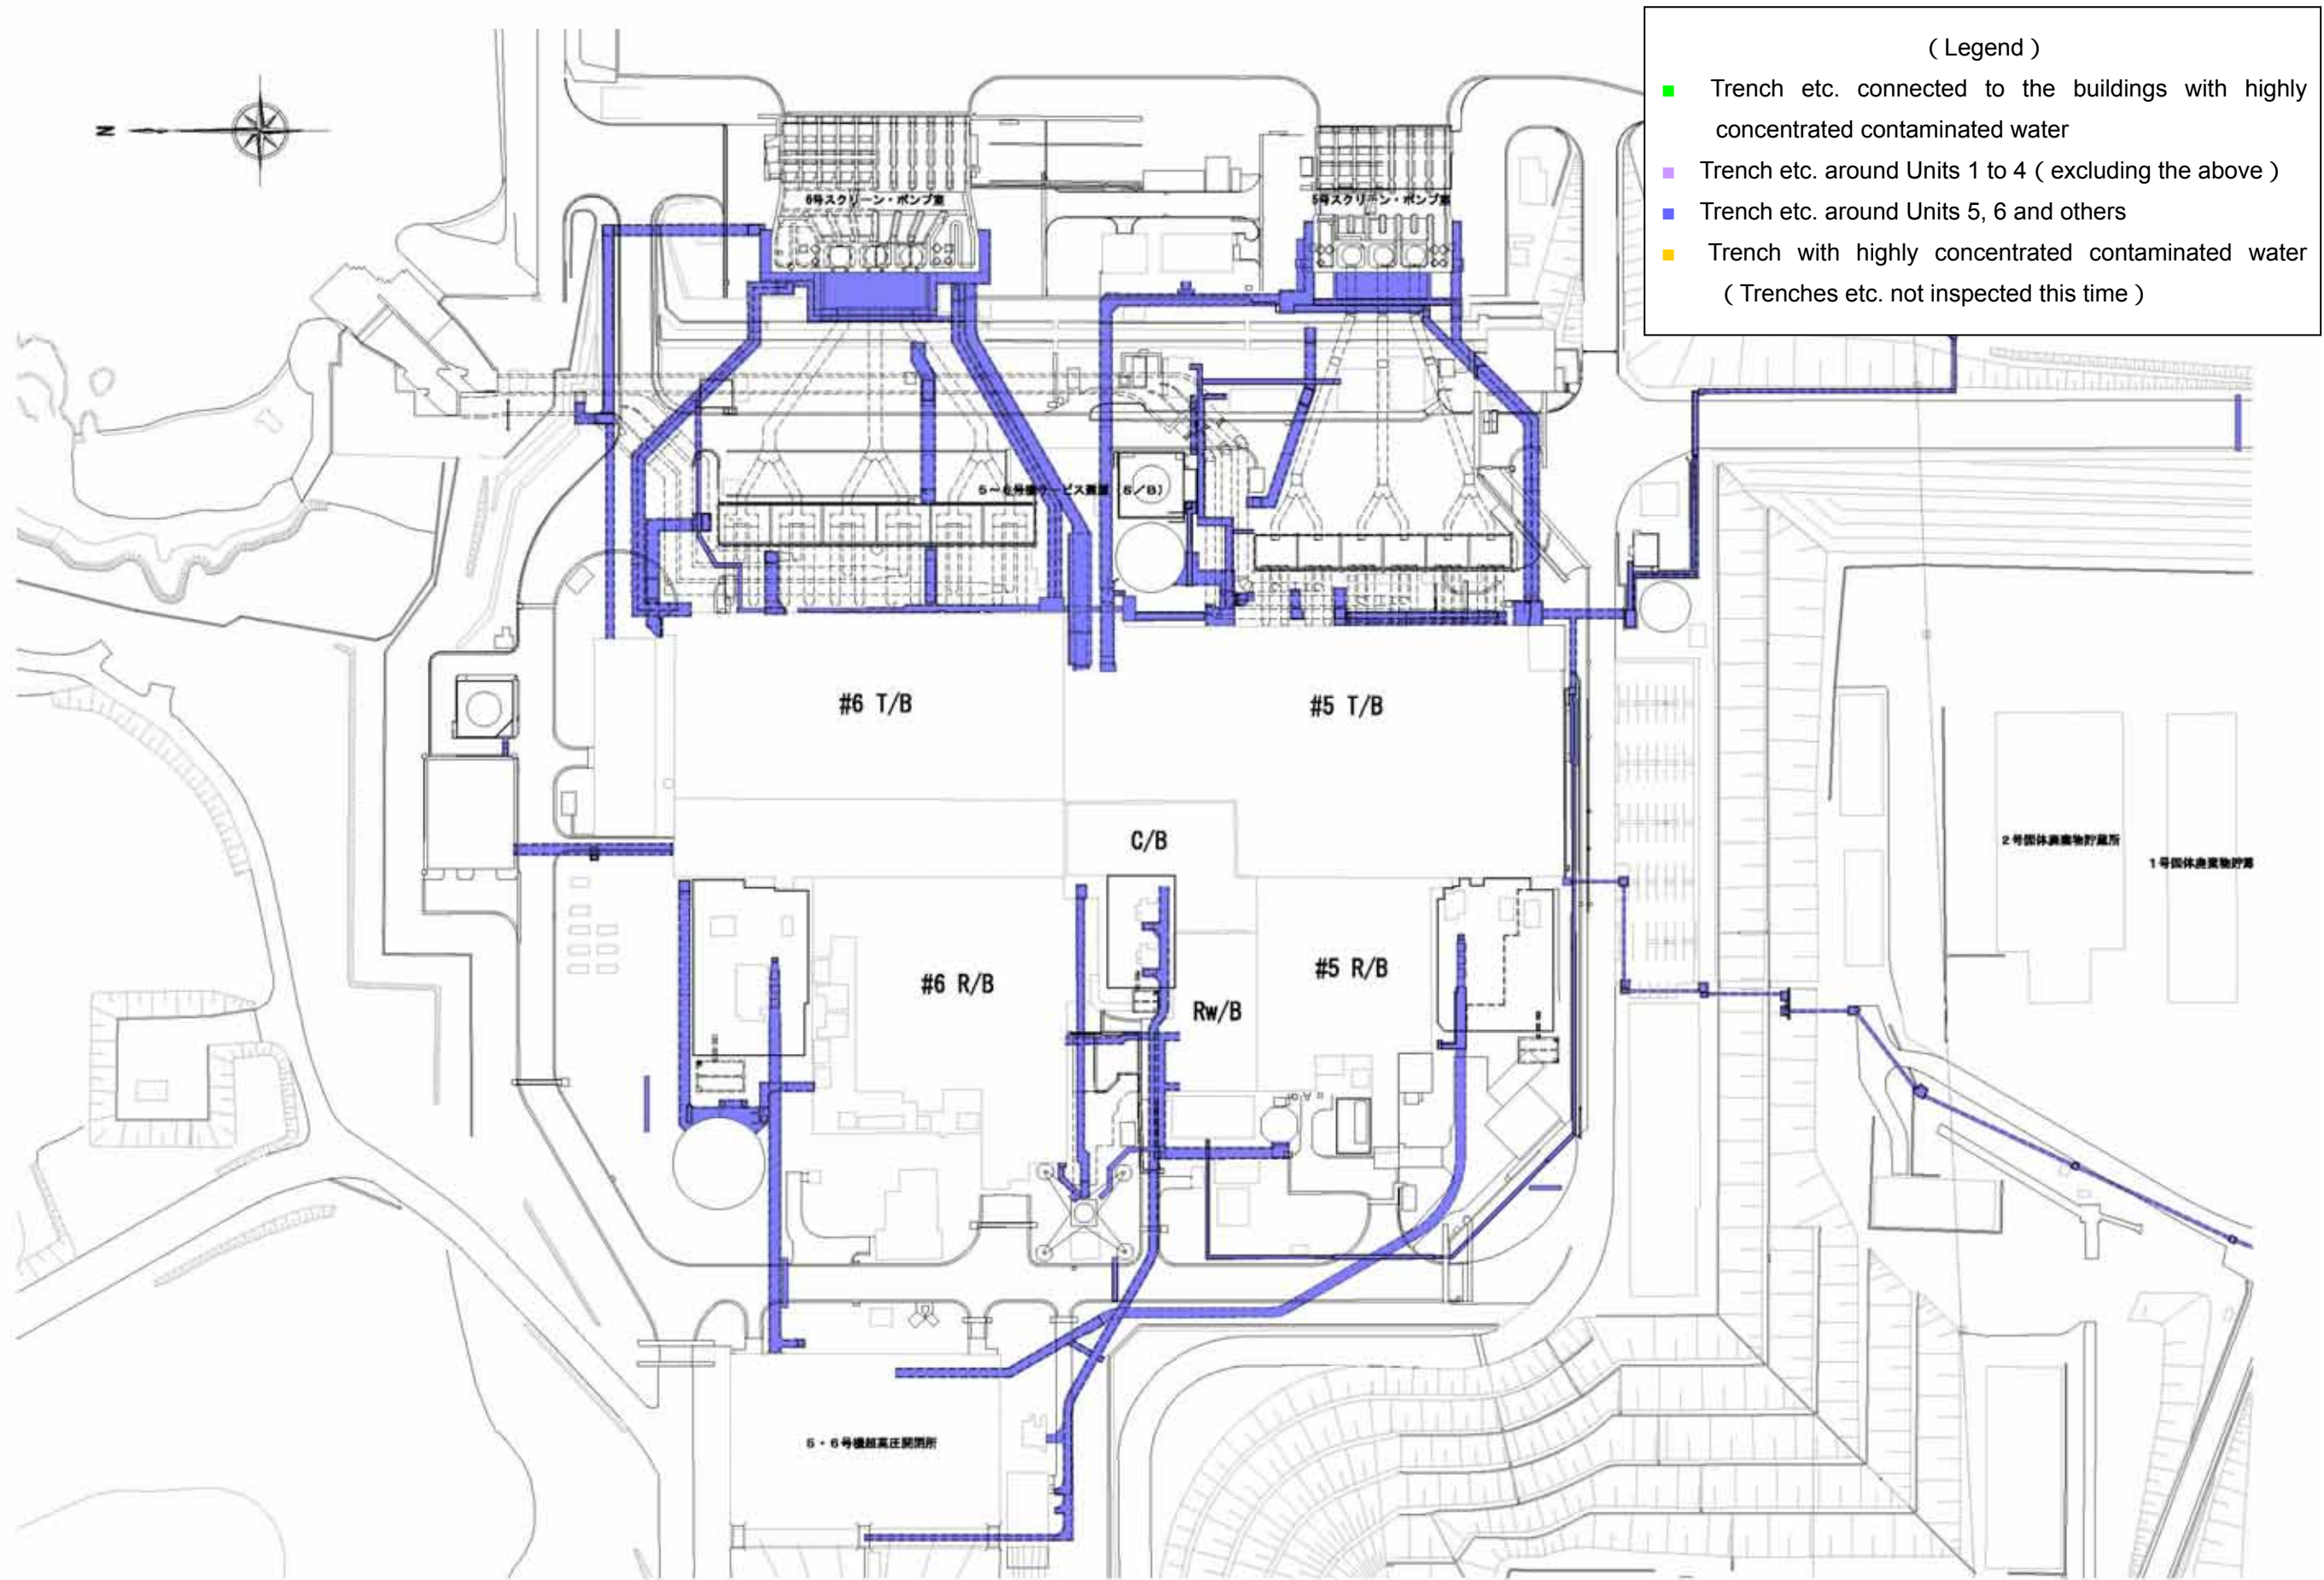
(3) Layout of Trenches etc. (Around Units 5 and 6)
